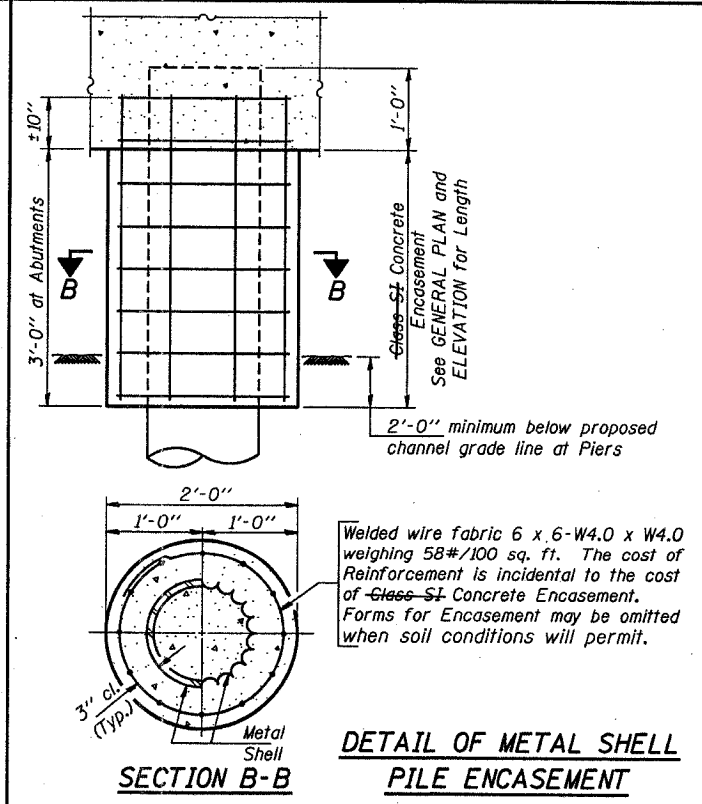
DETAIL OF REINFORCEMENT FOR METAL SHELLS
